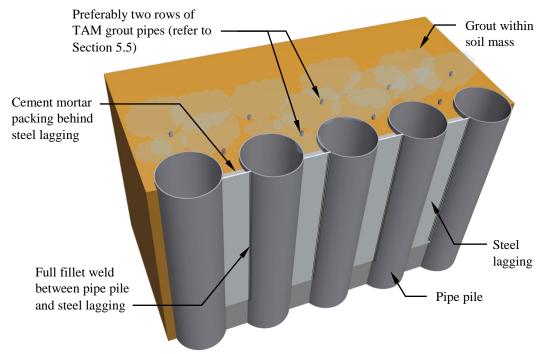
Typical Pipe Pile Wall with Grout Curtain
